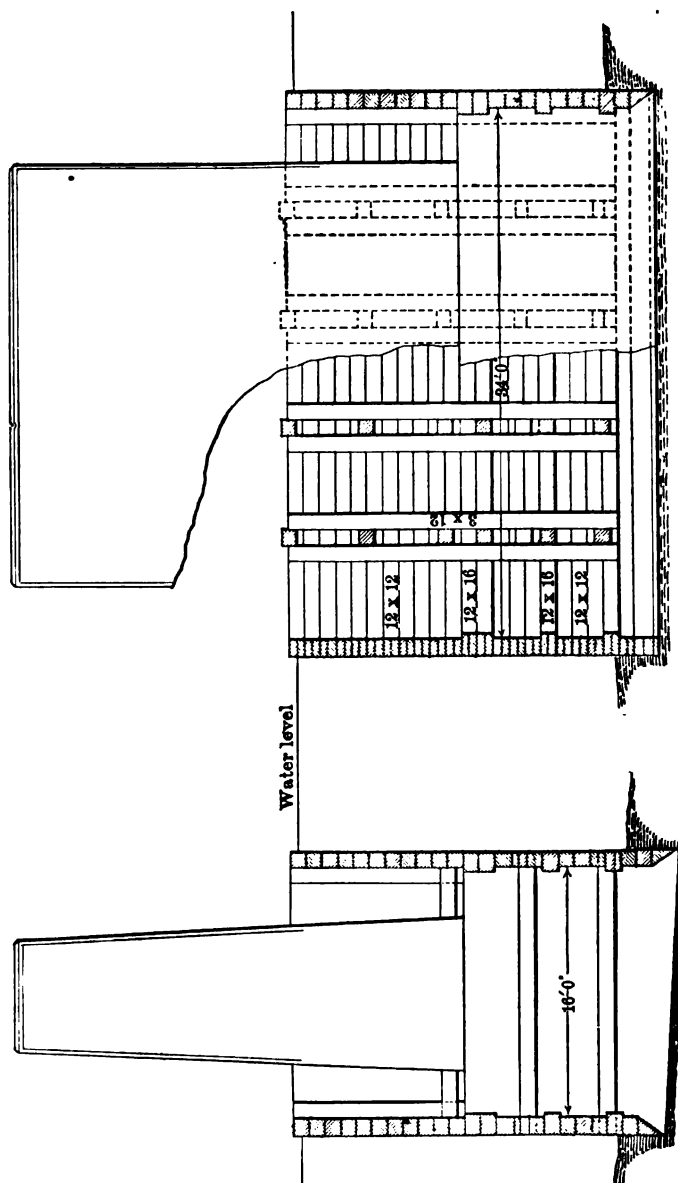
ARNPRIOR BRIDGE, CRIB AND COFFER-DAM.
